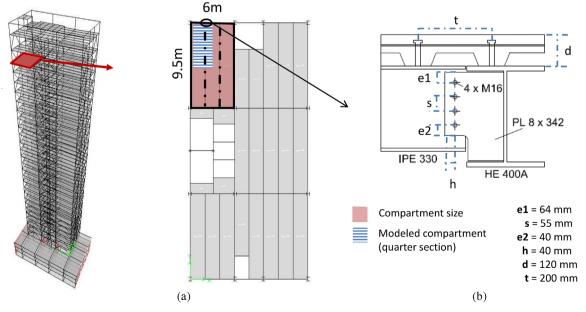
Case study: 28-story tall steel building: (a) the floor layout, and (b) the bolted single plate shear connection detail.
